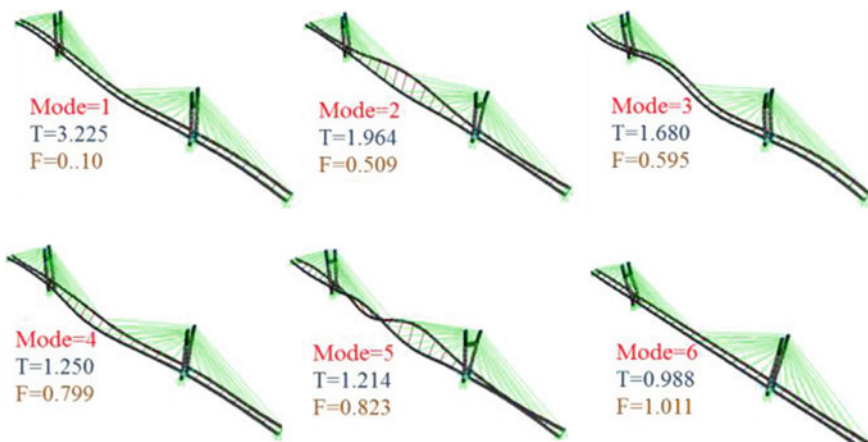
First six mode shapes of H shape pylon cable-stayed bridge
